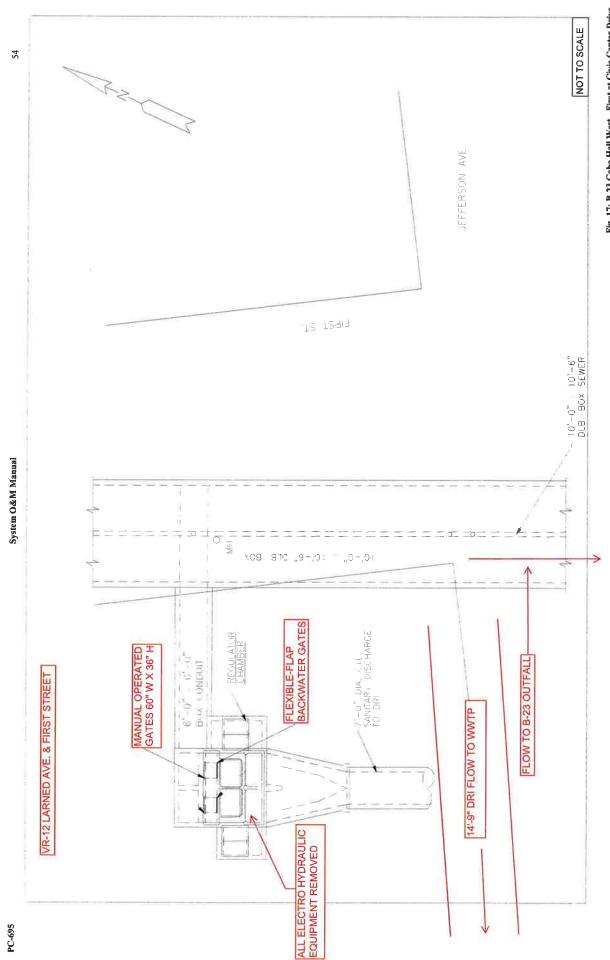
B-23 Cobo Hall West - First at Civic Center Drive
